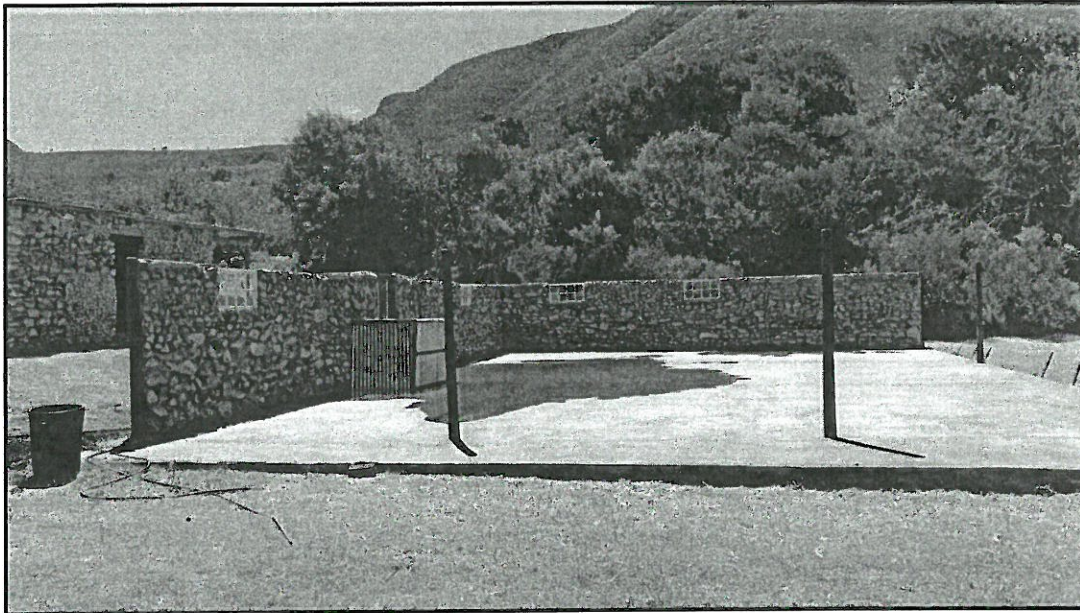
Proposed venue/place of entertainment (existing concrete slab).
